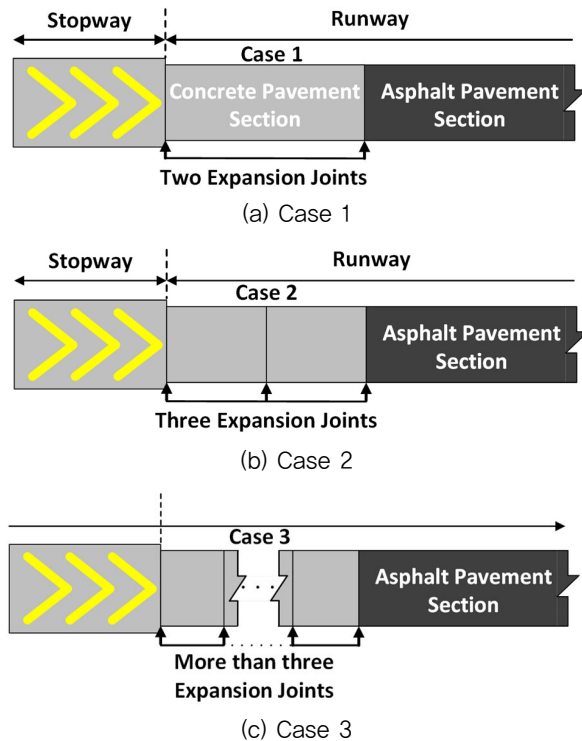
Cases for Installation of Expansion Joints in Concrete Pavement
